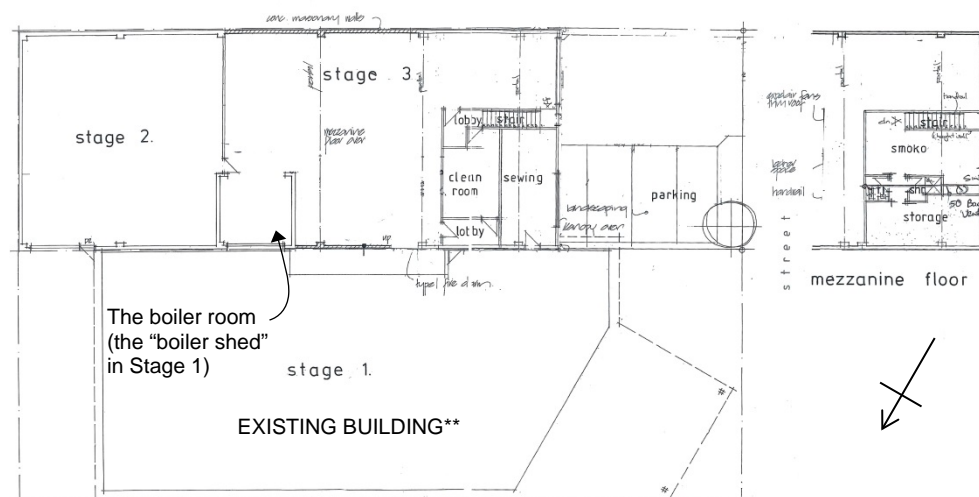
Floor plan showing stages 2 & 3 (from 2014 as-built plans, not to scale)
